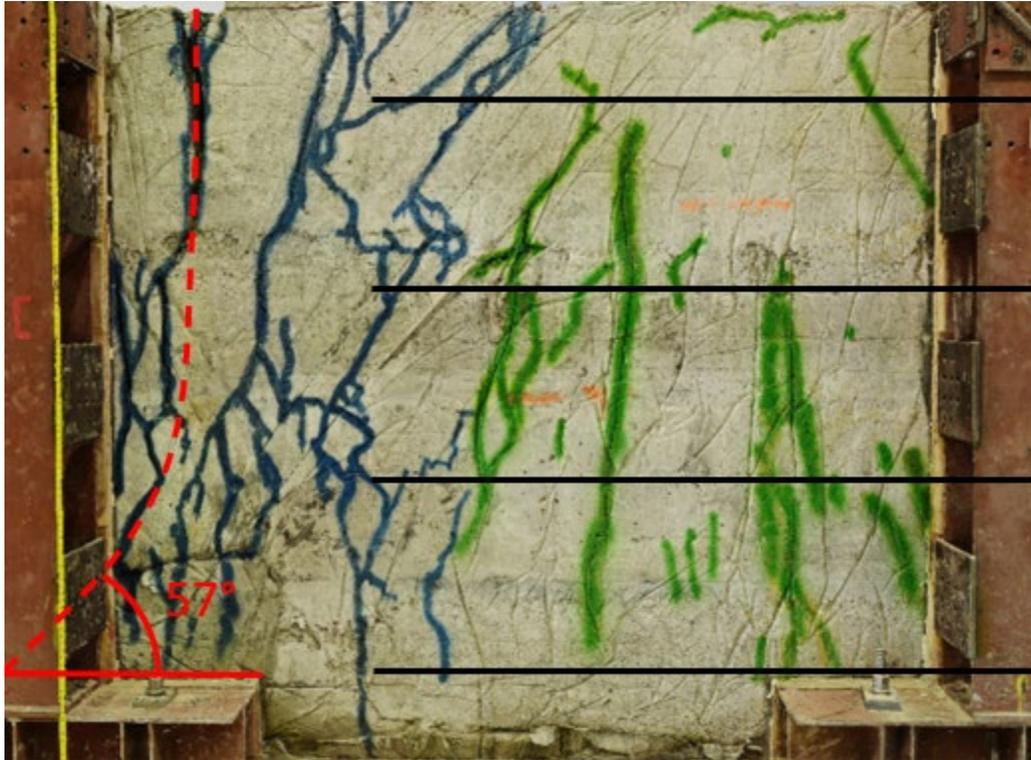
Photo showing the green crack patterns adjacent to the MSE wall with the six-foot wide surcharge load adjacent to the MSE wall. Blue crack patterns are for a second test with six-foot wide surcharge load adjacent to free face. Reinforcement locations are shown by horizontal black lines.
